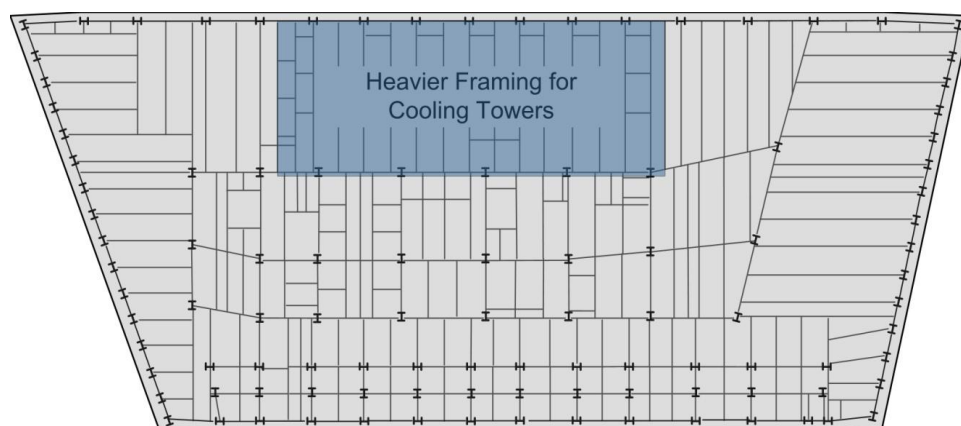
Floor 46 framing plan [2]. Based on structural drawings [15].
